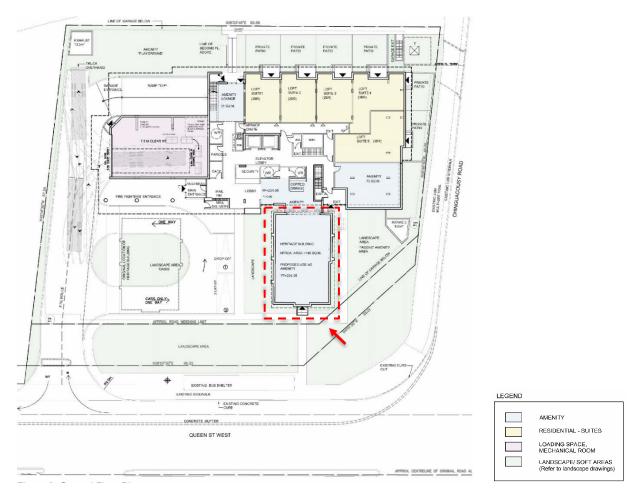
Proposed Ground Floor Plan of the new residential development showing the relocated and integrated Heritage Resource
